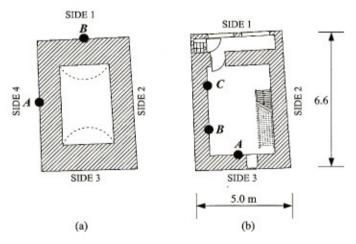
Torre Astesiano: plan of the single and double flat-jack testing points at (a) foundation; (b) third floor level
